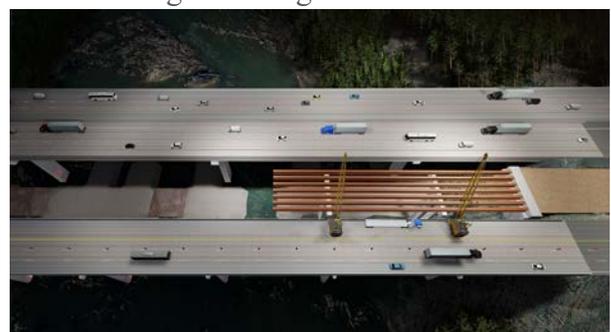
Phase 3 Erection of Structural Steel Girders at Spans G and H
